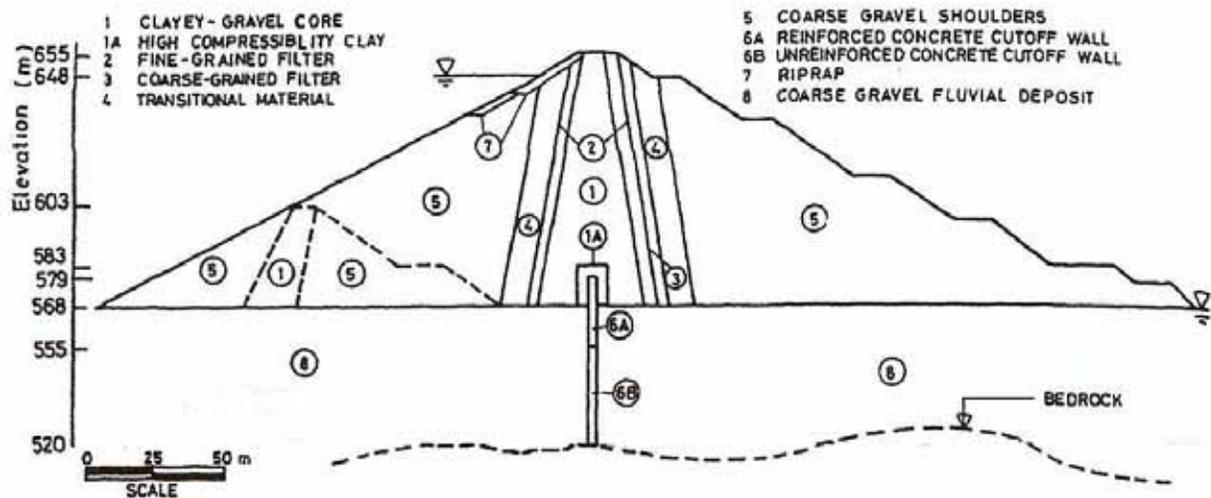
Typical section of embankment (from Rodriguez-Roa, 1992)
